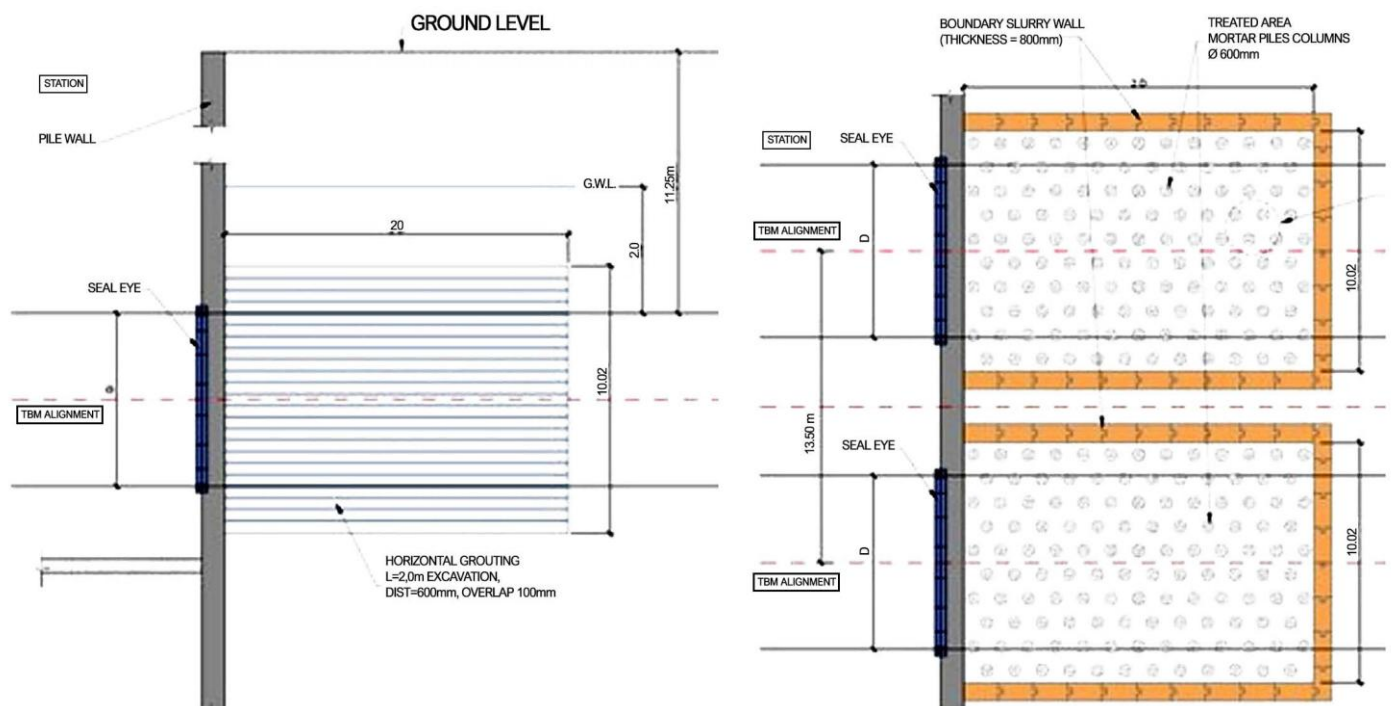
Boundary slurry wall with mortar piles and horizontal jet-grouting
